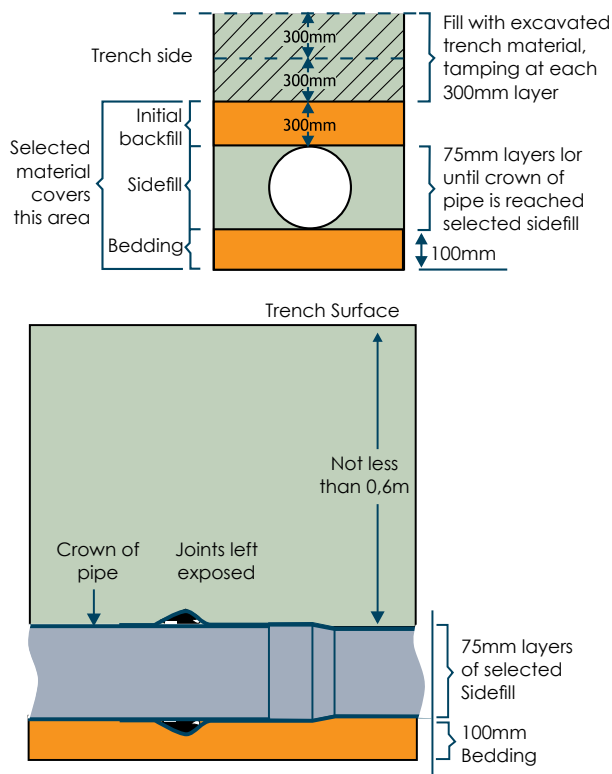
BEDDING AND BACKFILL DETAILS
